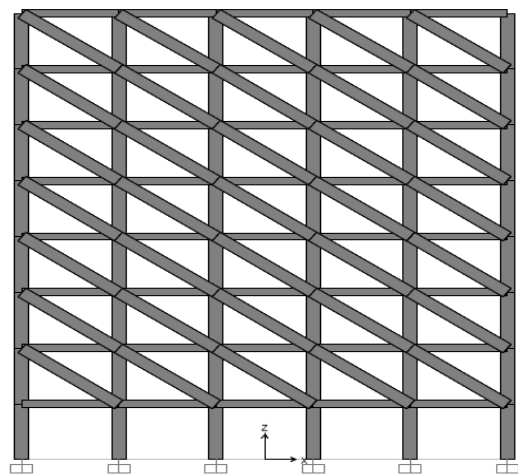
Elevation of the eight storeyed building models with openings (10% to 30%)
